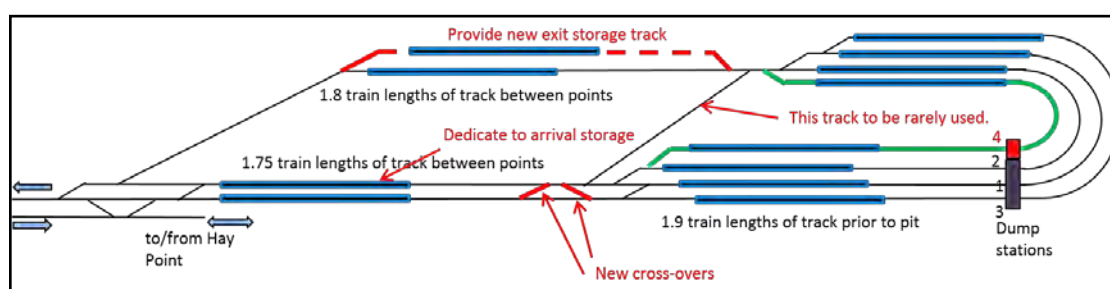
Proposed 8X rail loop modifications shown in red as proposed to be constructed with the IL4 dump station. The fourth rail loop in green would be constructed only at the later 9X stage.
